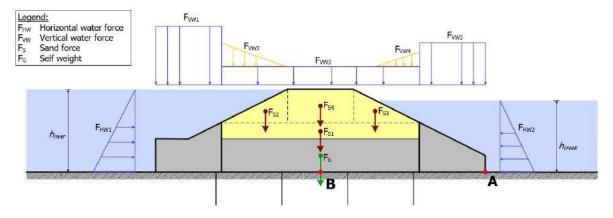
Horizontal and vertical forces on the Swan Creek Floodgate.
